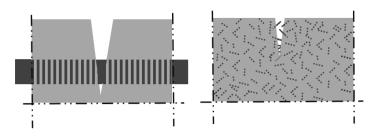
Different methods for reinforcing of concrete; with steel bar (left) and with fibres (right)
